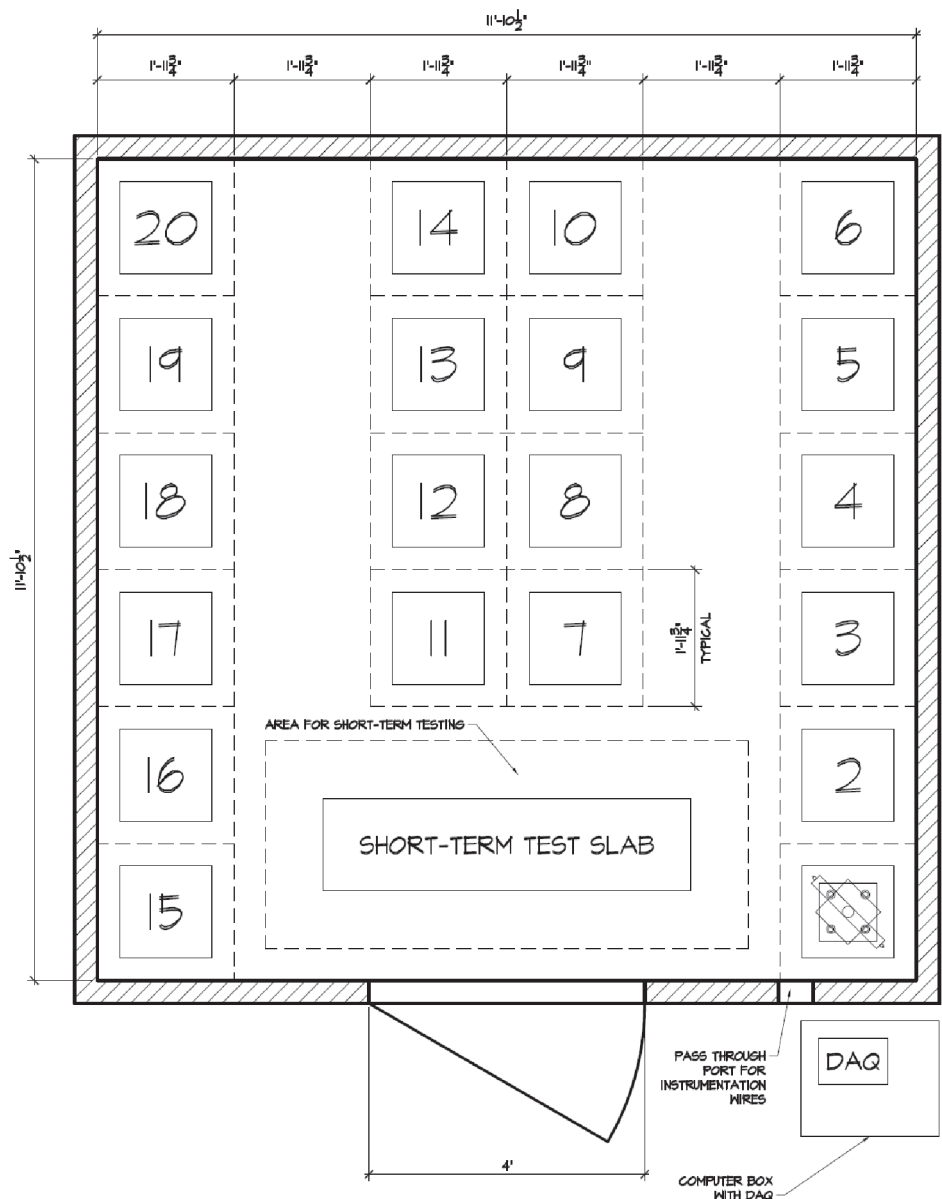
Layout of anchor pullout test frames in the stability chamber.
